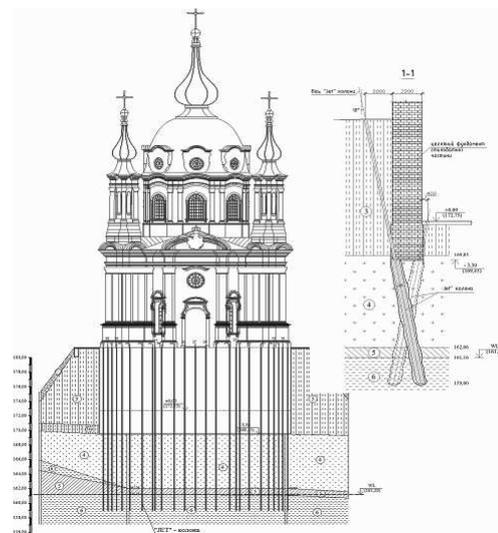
Underpinning with jet grouting columns of St. Andrew Church in Kyiv (Ukraine) (Slyusarenko *et al.* 2013).
